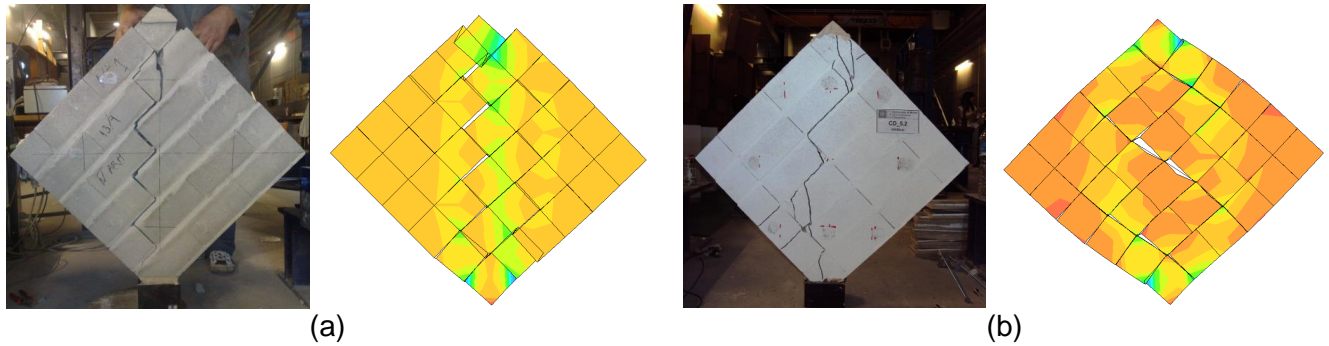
Failure modes: (a) Unreinforced masonry and (b) VRM2.
